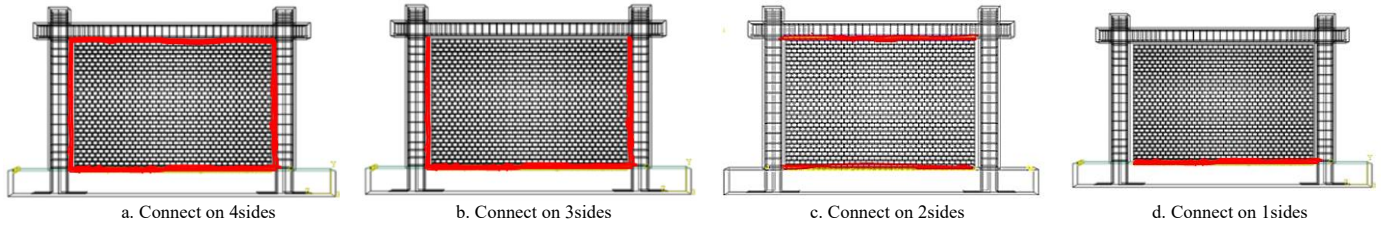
Connection details between infilled masonry and the reinforced concrete frame.
